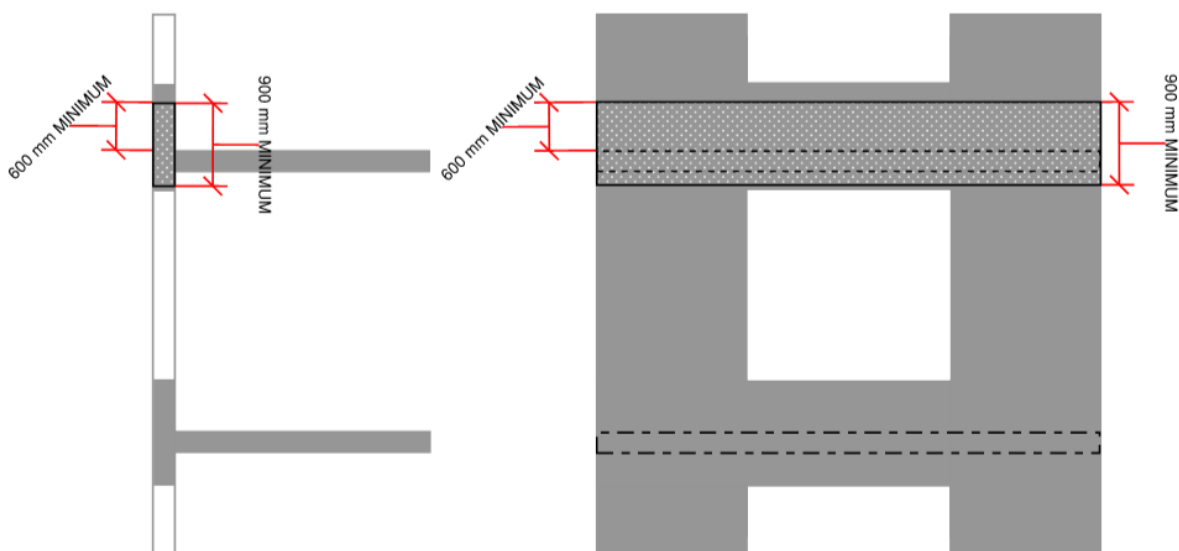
Cross section (left) and elevation view (right) for vertical configuration removal
